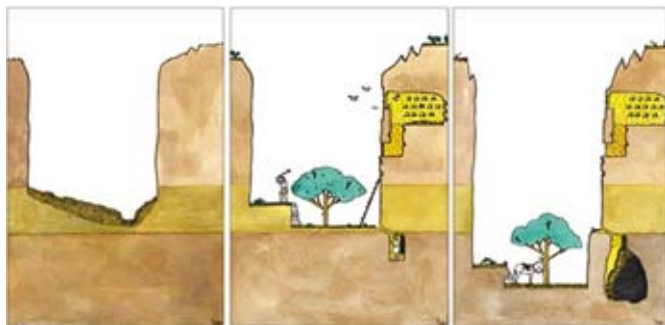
Sketch of construction of a drainage tunnel for land reclamation (drawing R. Bixio).
